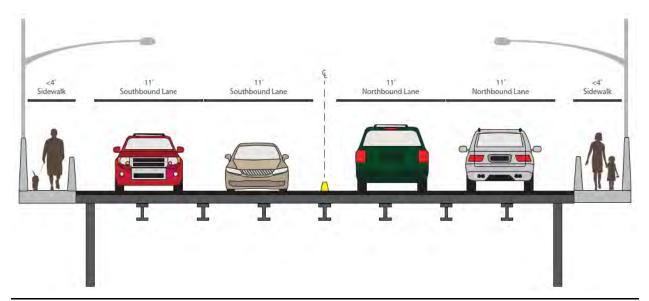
Existing Typical Section – Segment 2 (Warren Avenue Bridge)
